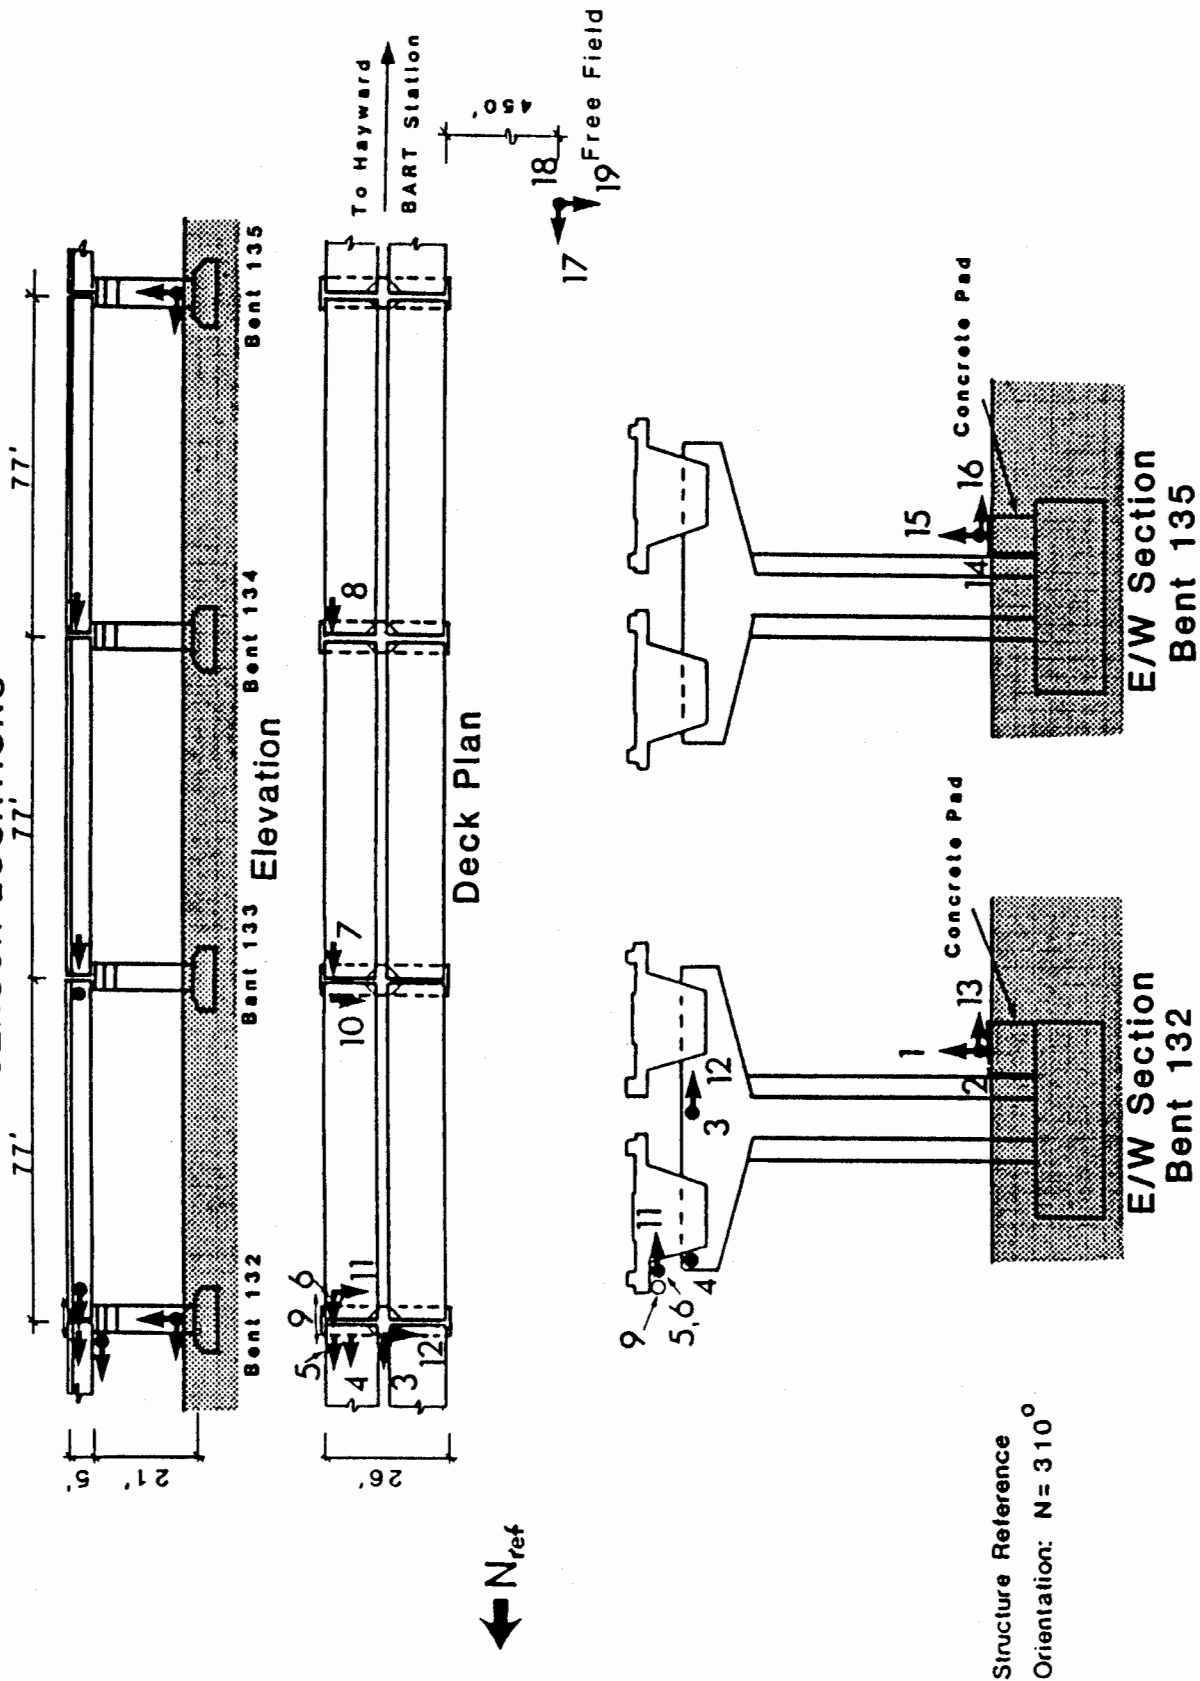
Structure Configuration of Hayward-BART Elevated Section and Sensor Locations
